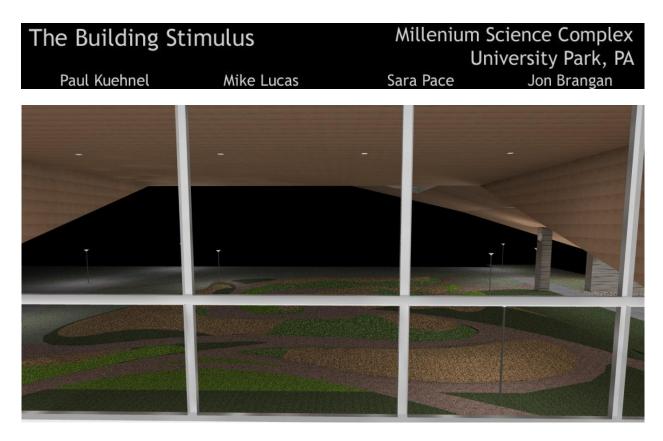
Exterior Plaza Lighting Design - Perspective View from 2nd Floor.
